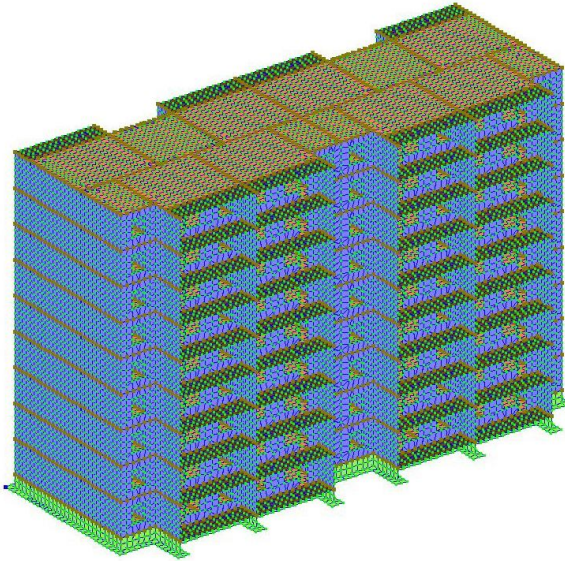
Calculation diagram of a 9-story building made of cross-laminated timber panels
